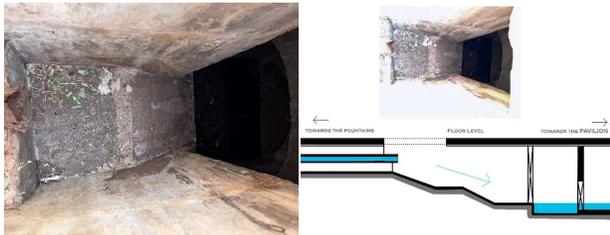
Shows aqueduct (Left: photograph and Right: cross section conceptual sketch running below Benazir palace from fountains to Pavilion, Source: Author
